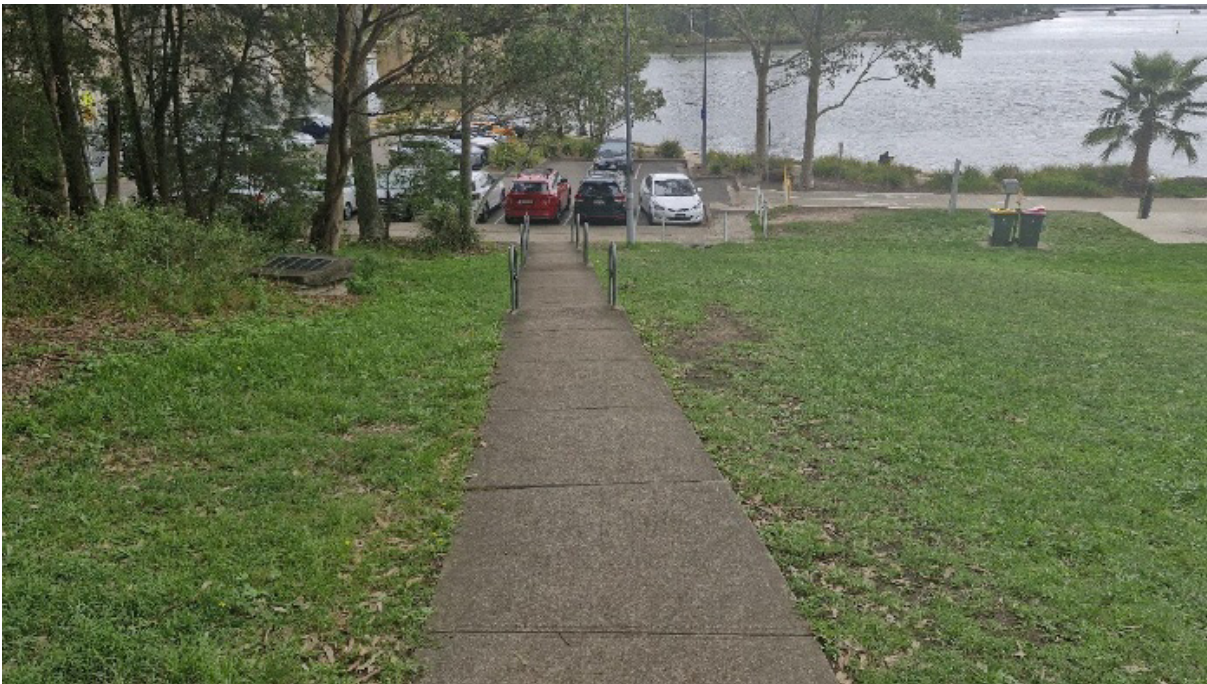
Indicative of Memorial Park pipeline alignment with Parramatta River shoreline and parking lot off Bowden Street in background. View south.
